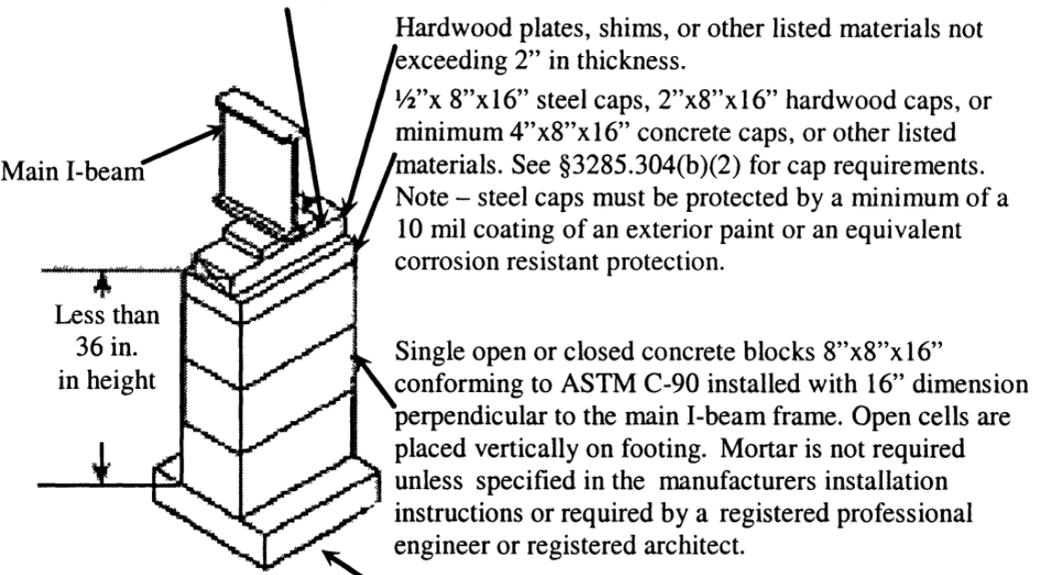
Typical Footing and Pier Design, Single Concrete Block.
